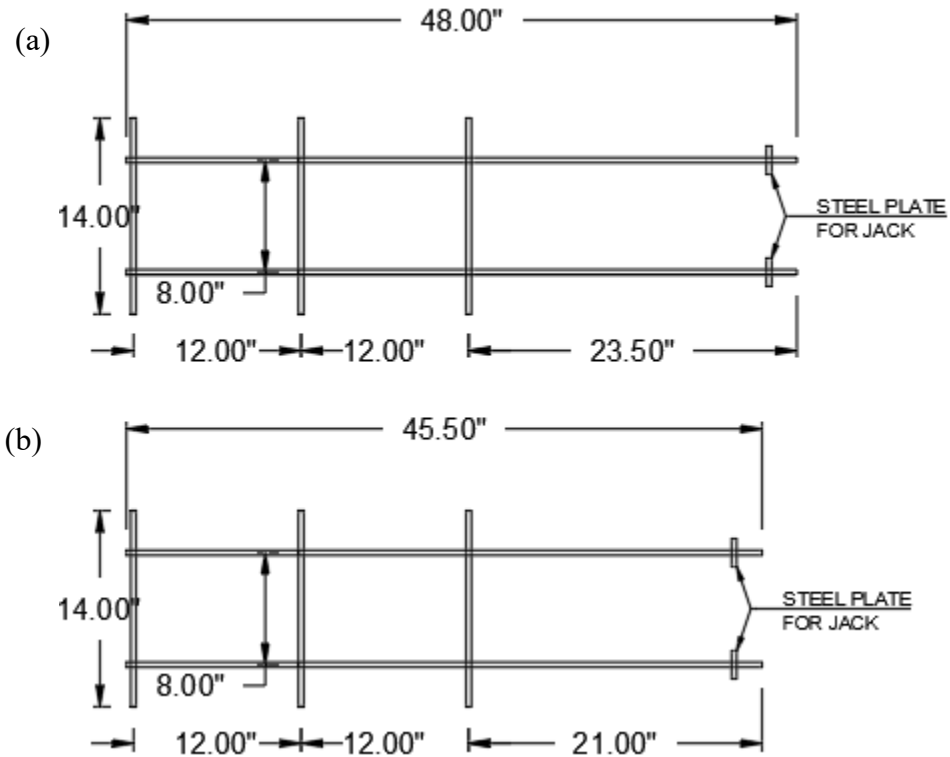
Dimensions of (a) longer welded-wire reinforcement, and (b) shorter welded-wire reinforcement used in Test 6.
